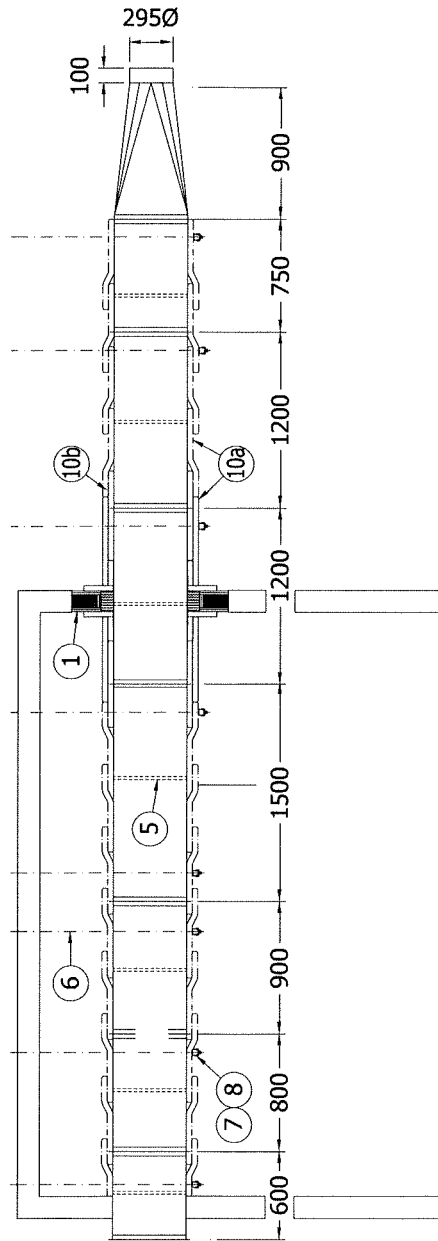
Typical Side View of Installed Horizontal Assembly
